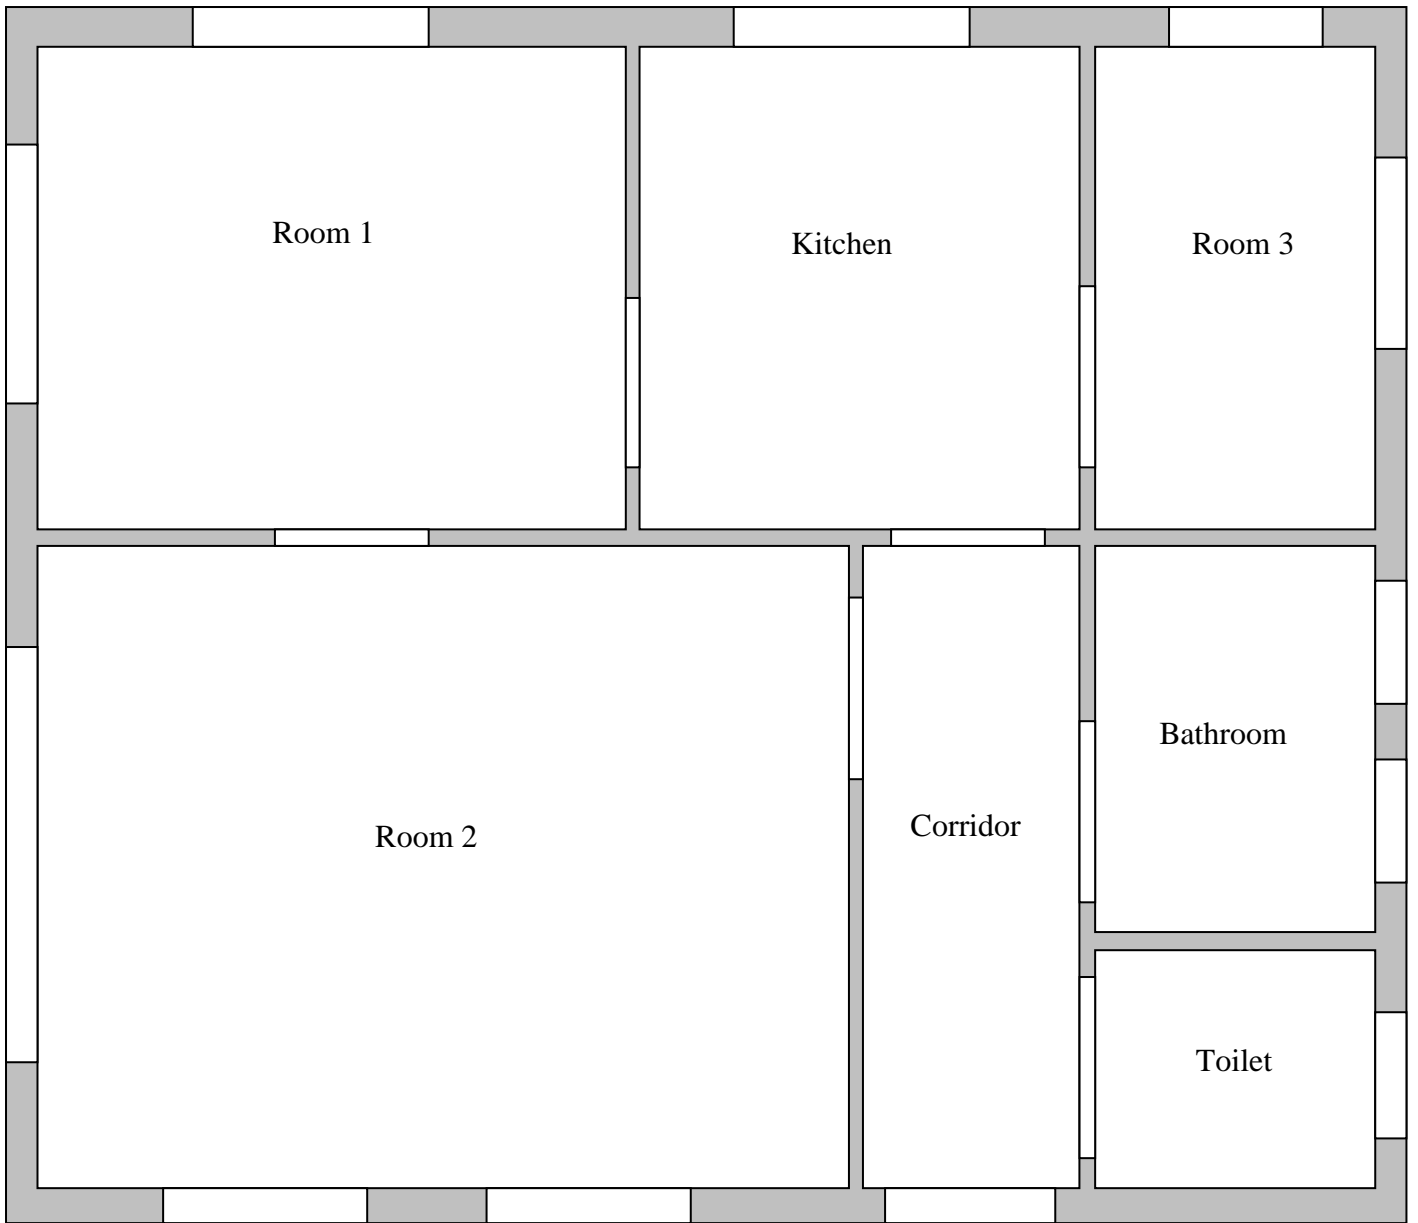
A plan of an apartment with individual rooms, heat source and heaters for the heating
